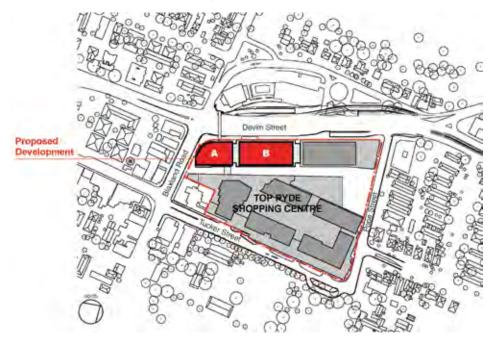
Plan view of the location of the proposed development within the TRSC site
